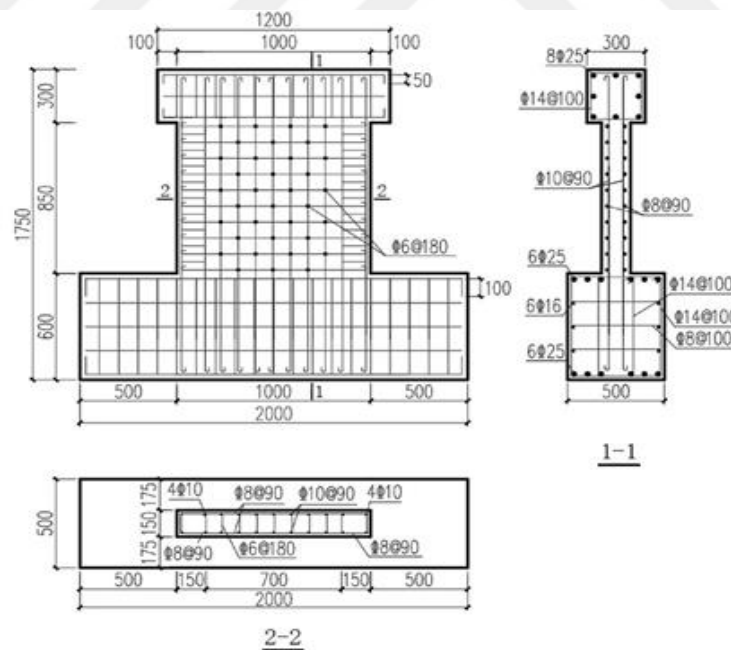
Specimen Geometry and Reinforcing Plans.
